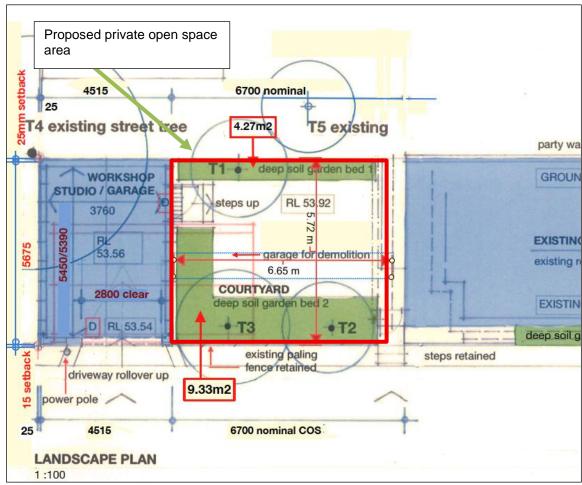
Mark-up of Drawing No. DA.08 of the architectural plans prepared by Studio GA illustrating the proposed private open space area.
